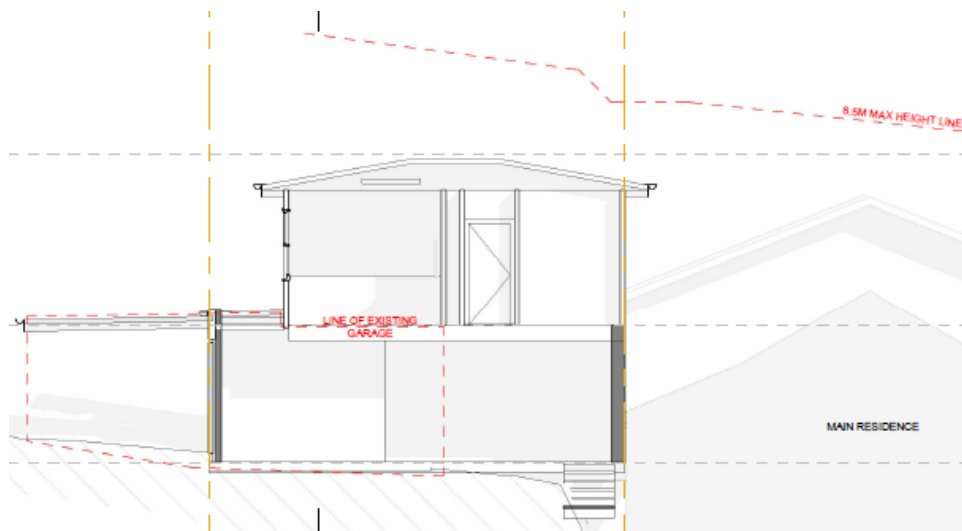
Plan extract Section A demonstrating compliance with building height (source: Studio Lykke)
